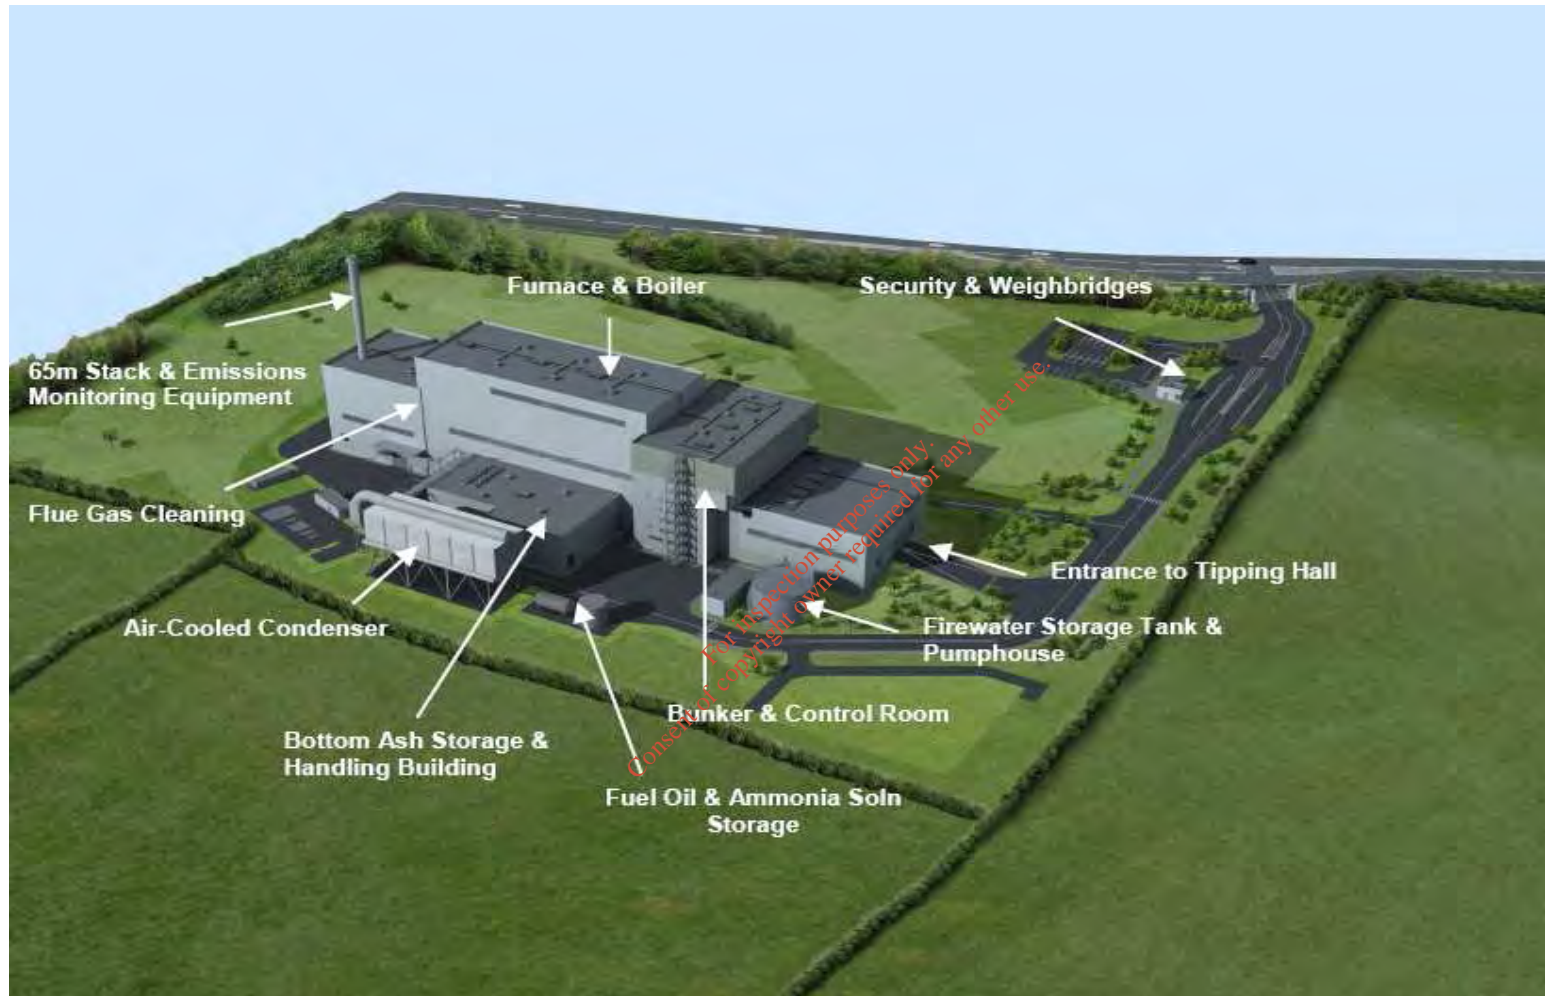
Detailed Layout of the Amended Waste to Energy Facility
